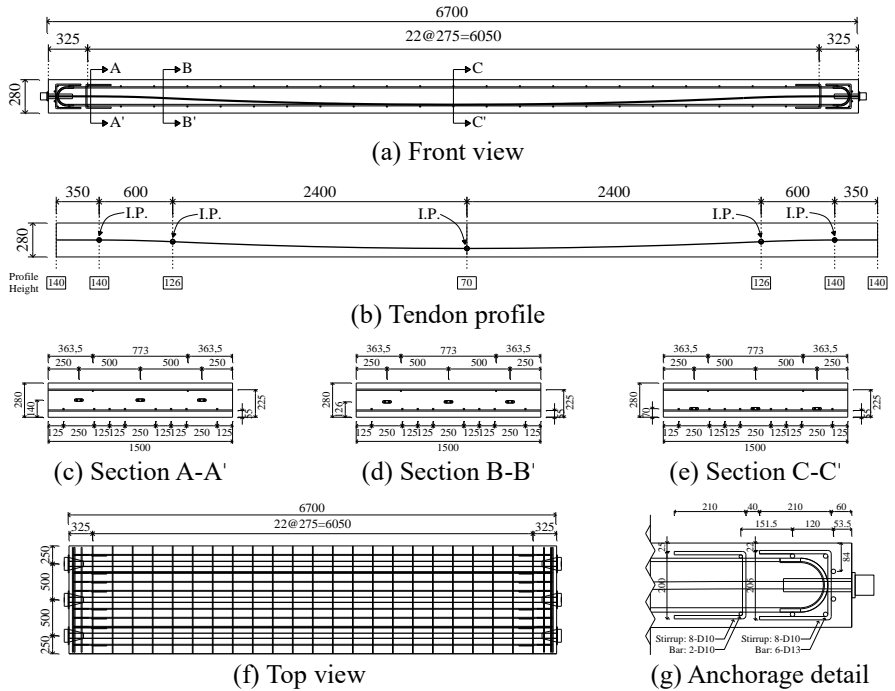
Details of Specimen PF-U3 (unit: mm)
